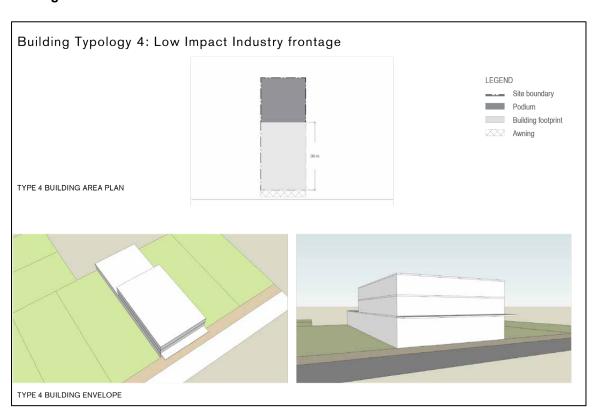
G – Mackay city centre local plan – building typology 4 – low impact industry frontage
